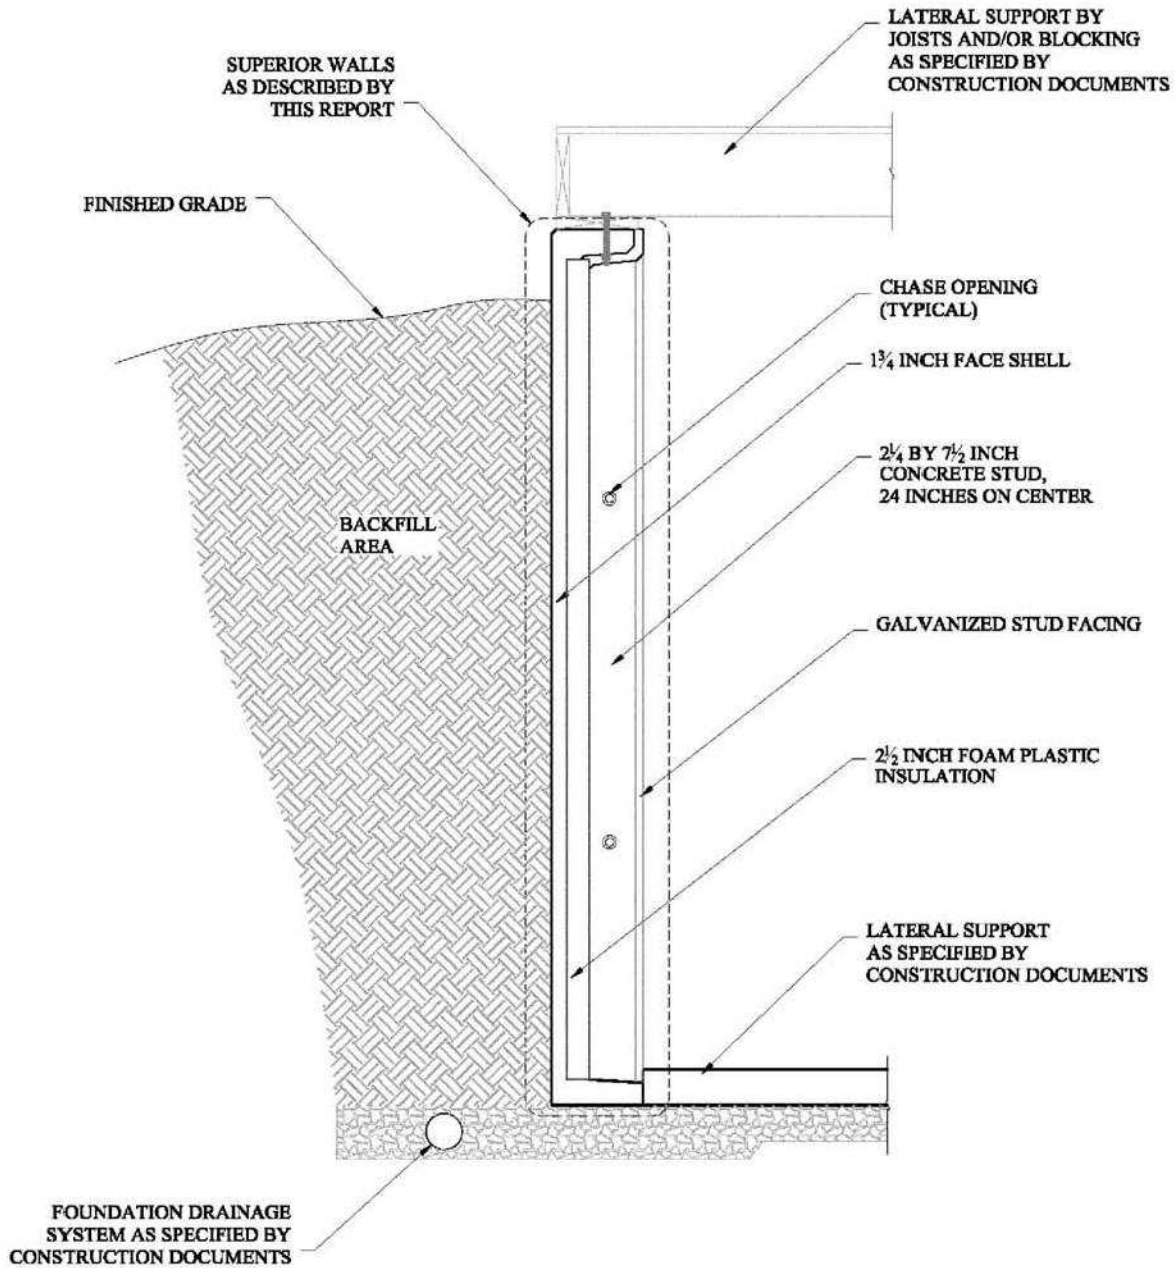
TYPICAL SUPERIOR WALL VERTICAL SECTION DETAIL
